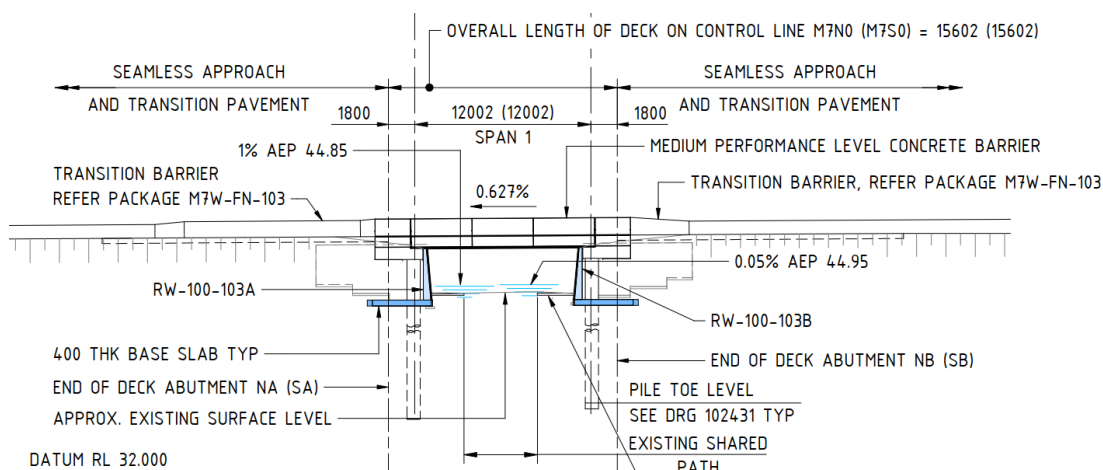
Abutment Elevation and Retaining Wall at Bridges Infra 35.1/35.2
